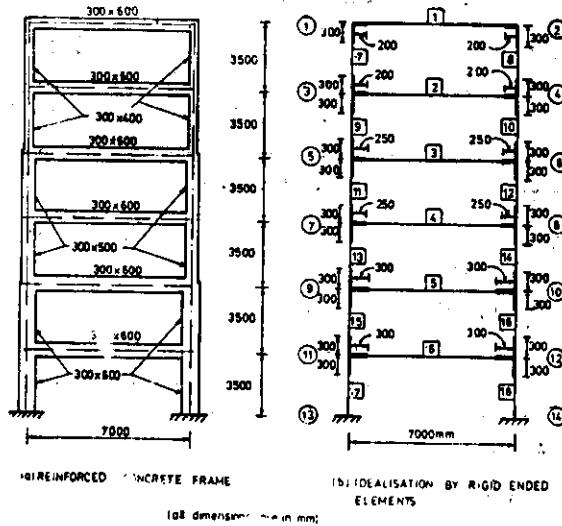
A Six Storeyed Reinforced Concrete Frame
